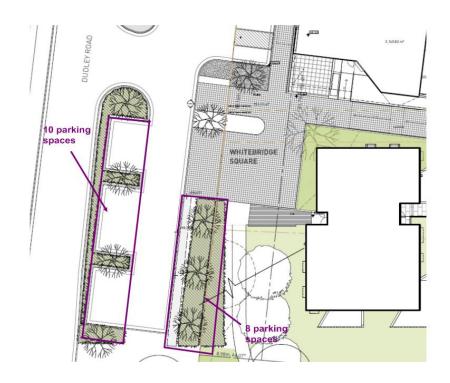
Plan of Dudley Road area showing 18 parking spaces
